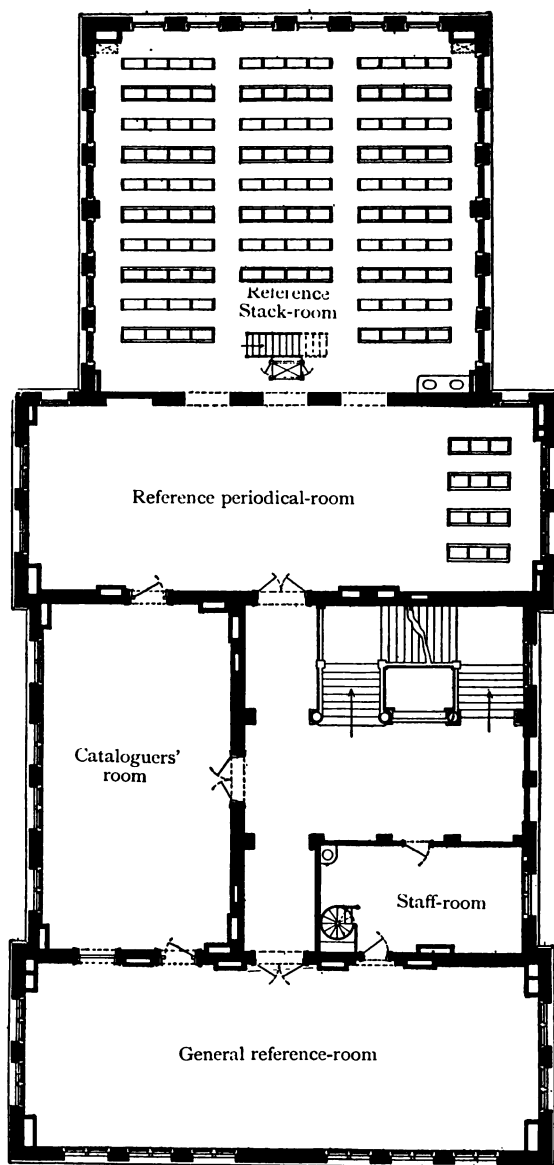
First floor plan of the Pratt Institute, Brooklyn.
